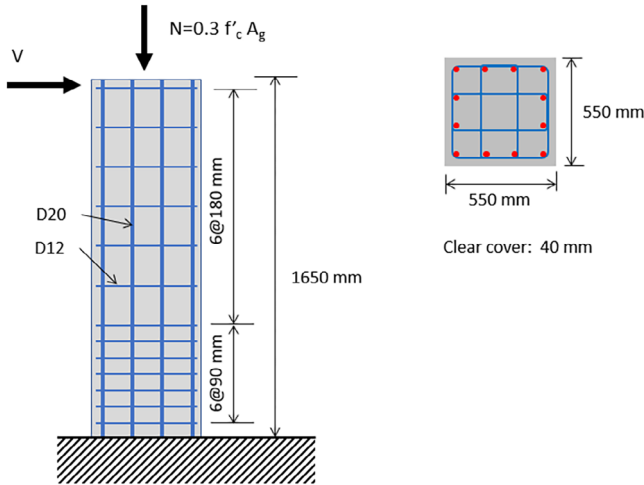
Specimen 7 tested by Tanaka.<sup>24,25</sup> Dimensions in mm.
